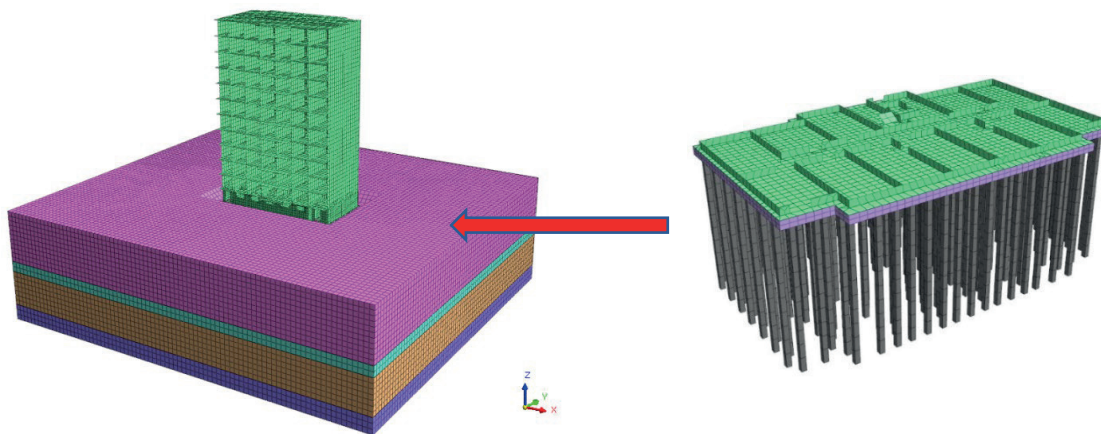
Basement-foundation-structure system with separation of the considered pile foundation (right)
